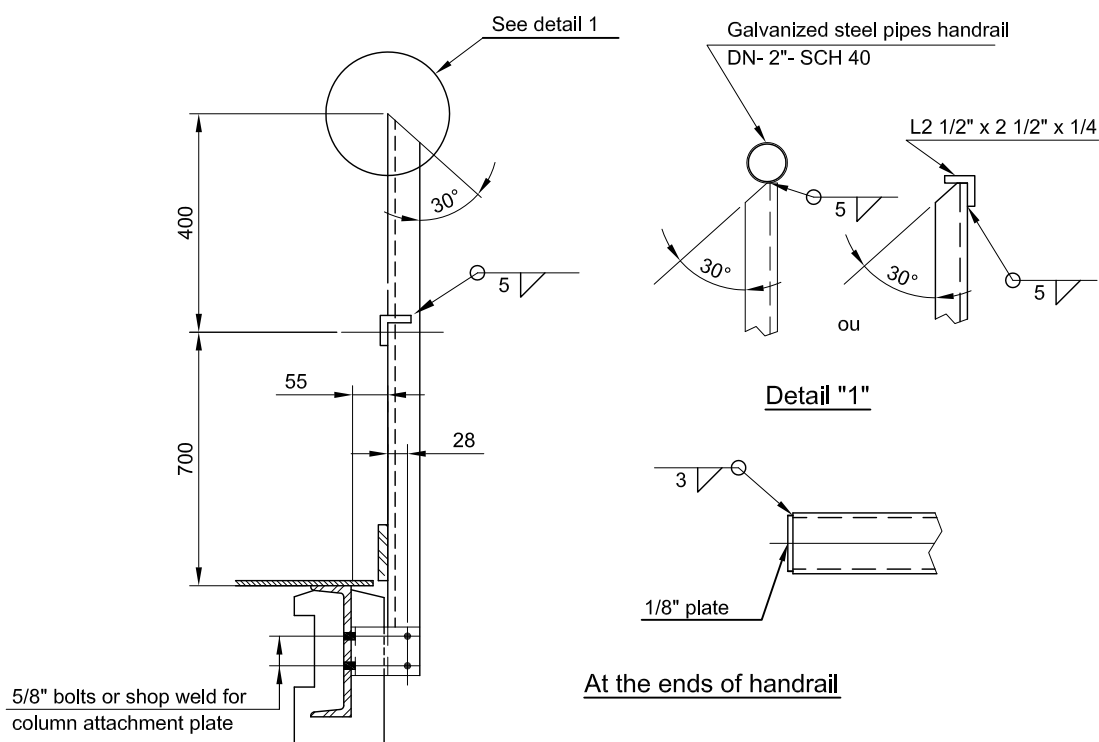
Typical Guardrail in U Beam with Fire Protection
